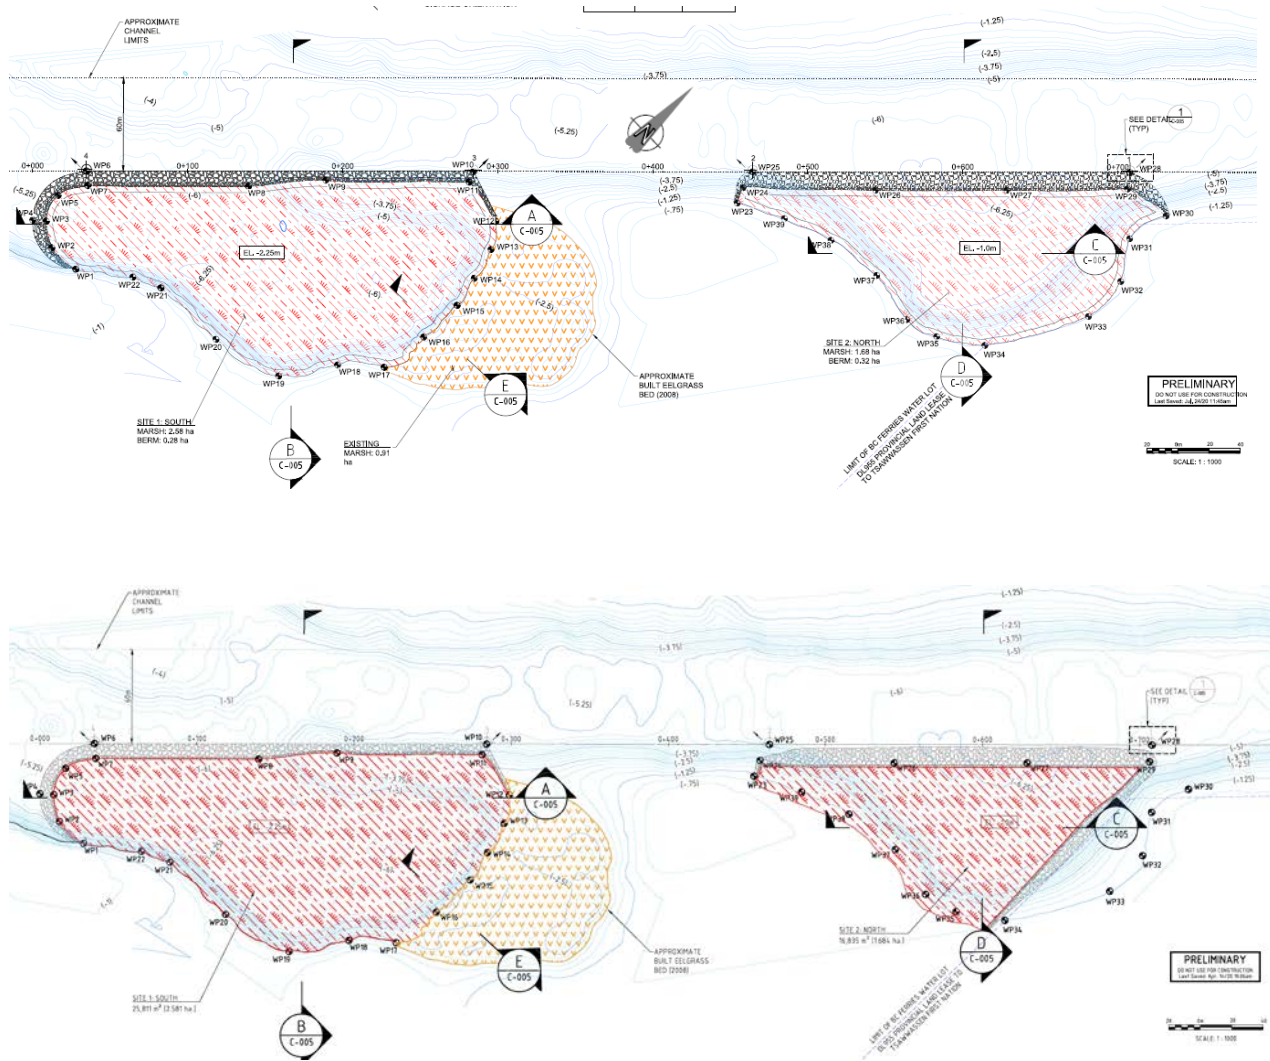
ORIGINAL LAYOUT (TOP) AND ALTERNATIVE LAYOUT (BOTTOM)
